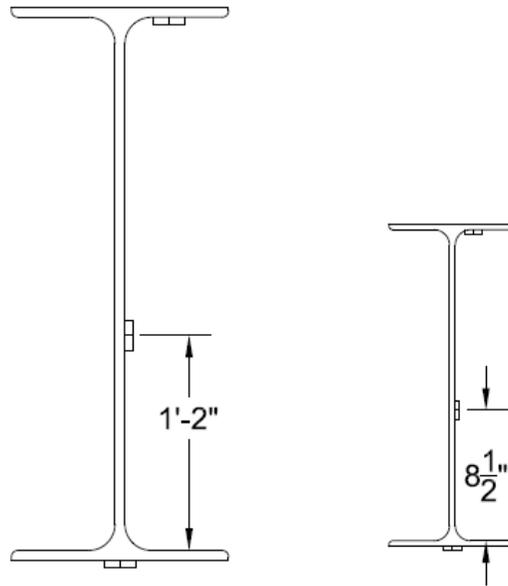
Gage location on Chester cross section of floor beams and stringers respectively
